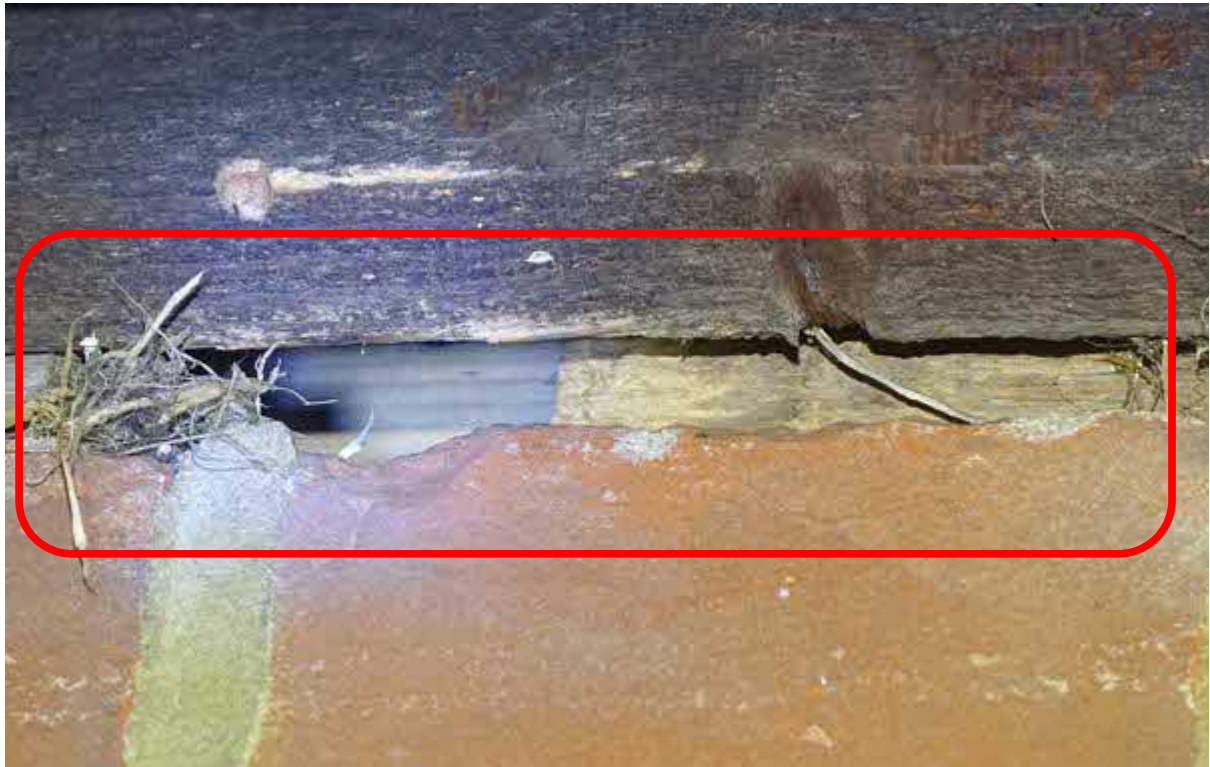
Building one – Internal view from within the building below the roof areas which offer a covered vaulted ceiling
